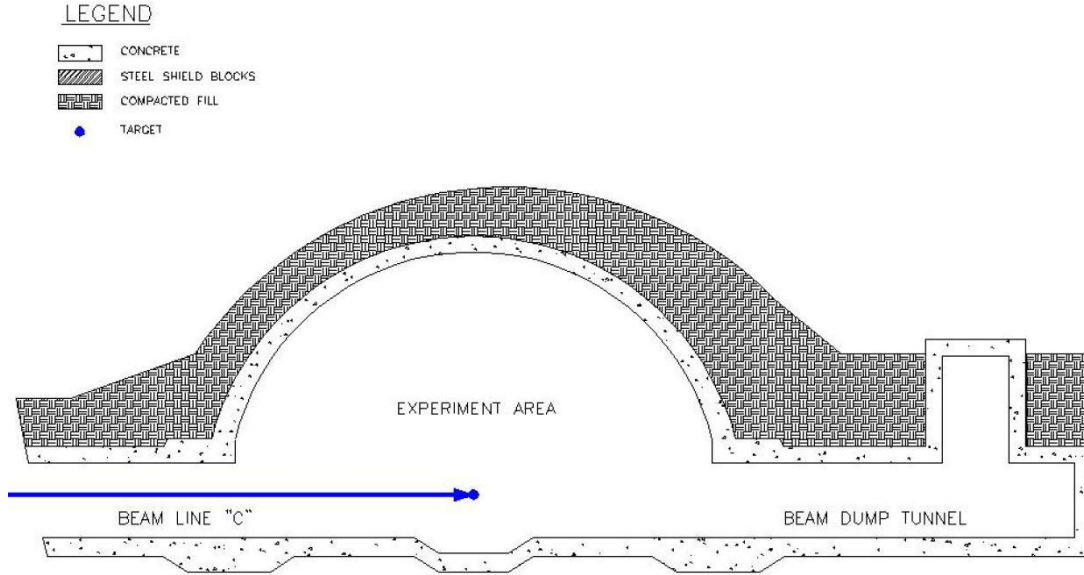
Cross-sectional view of the HRS Dome at LANSCE Area C.
